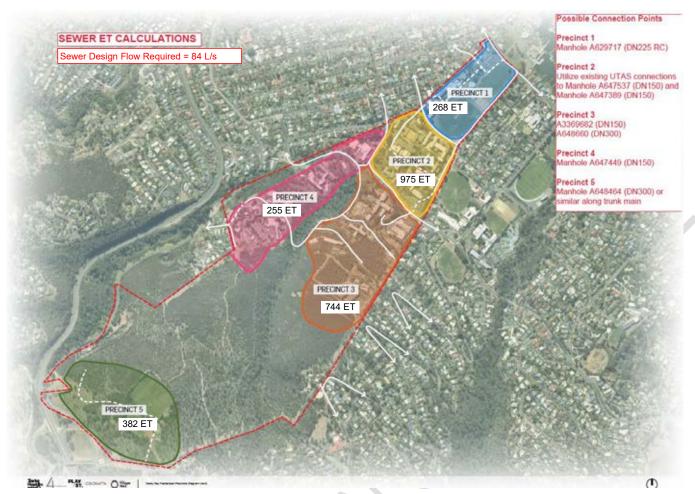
Proposed Sewer Loads and Connections for Masterplan for PSA submission
